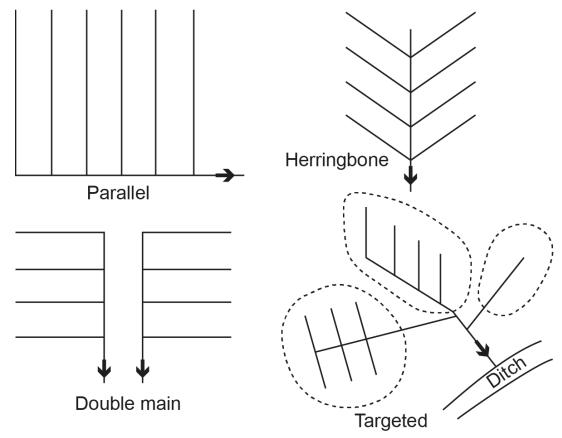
Various drainage system layout alternatives. (Skilled Trades BC, 2021) Used with permission.
